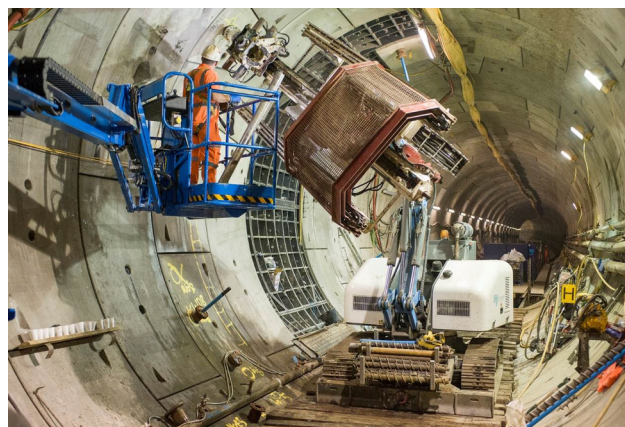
View of the plant deployed to drill the well points next to CP6 opening sets in the Eastbound running tunnel.
